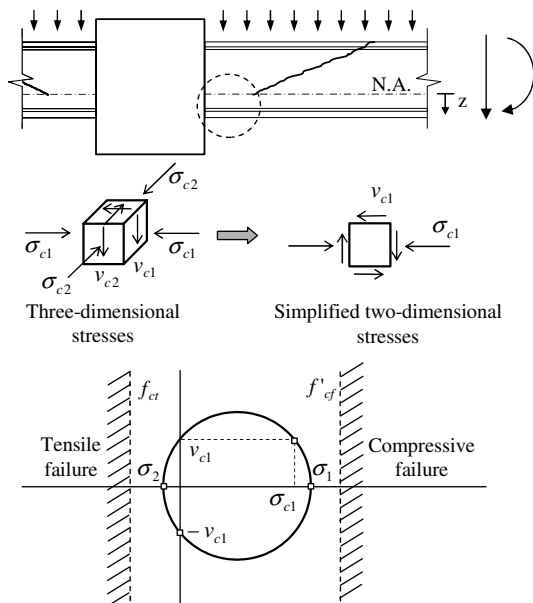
Rankine's failure criteria of fiber reinforced concrete.
